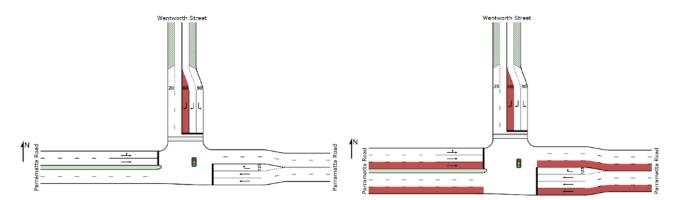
At-grade upgrades required for Parramatta Road/Wentworth Street intersection – V2, V3
